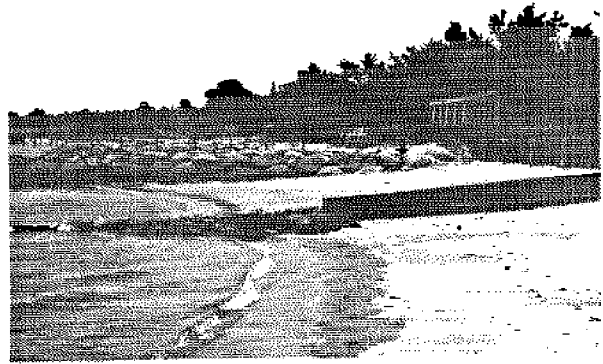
Sta. VIII. Groins 14 & 15, and seawall, looking southwest.
